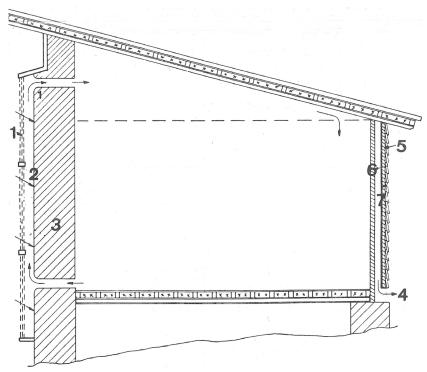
Trombe Wall, Winter heating and summer cooling. Section of the detached house with Trombe Wall, built in 1967 in Odeillo, France. (Architectural Design, 1/1975)
